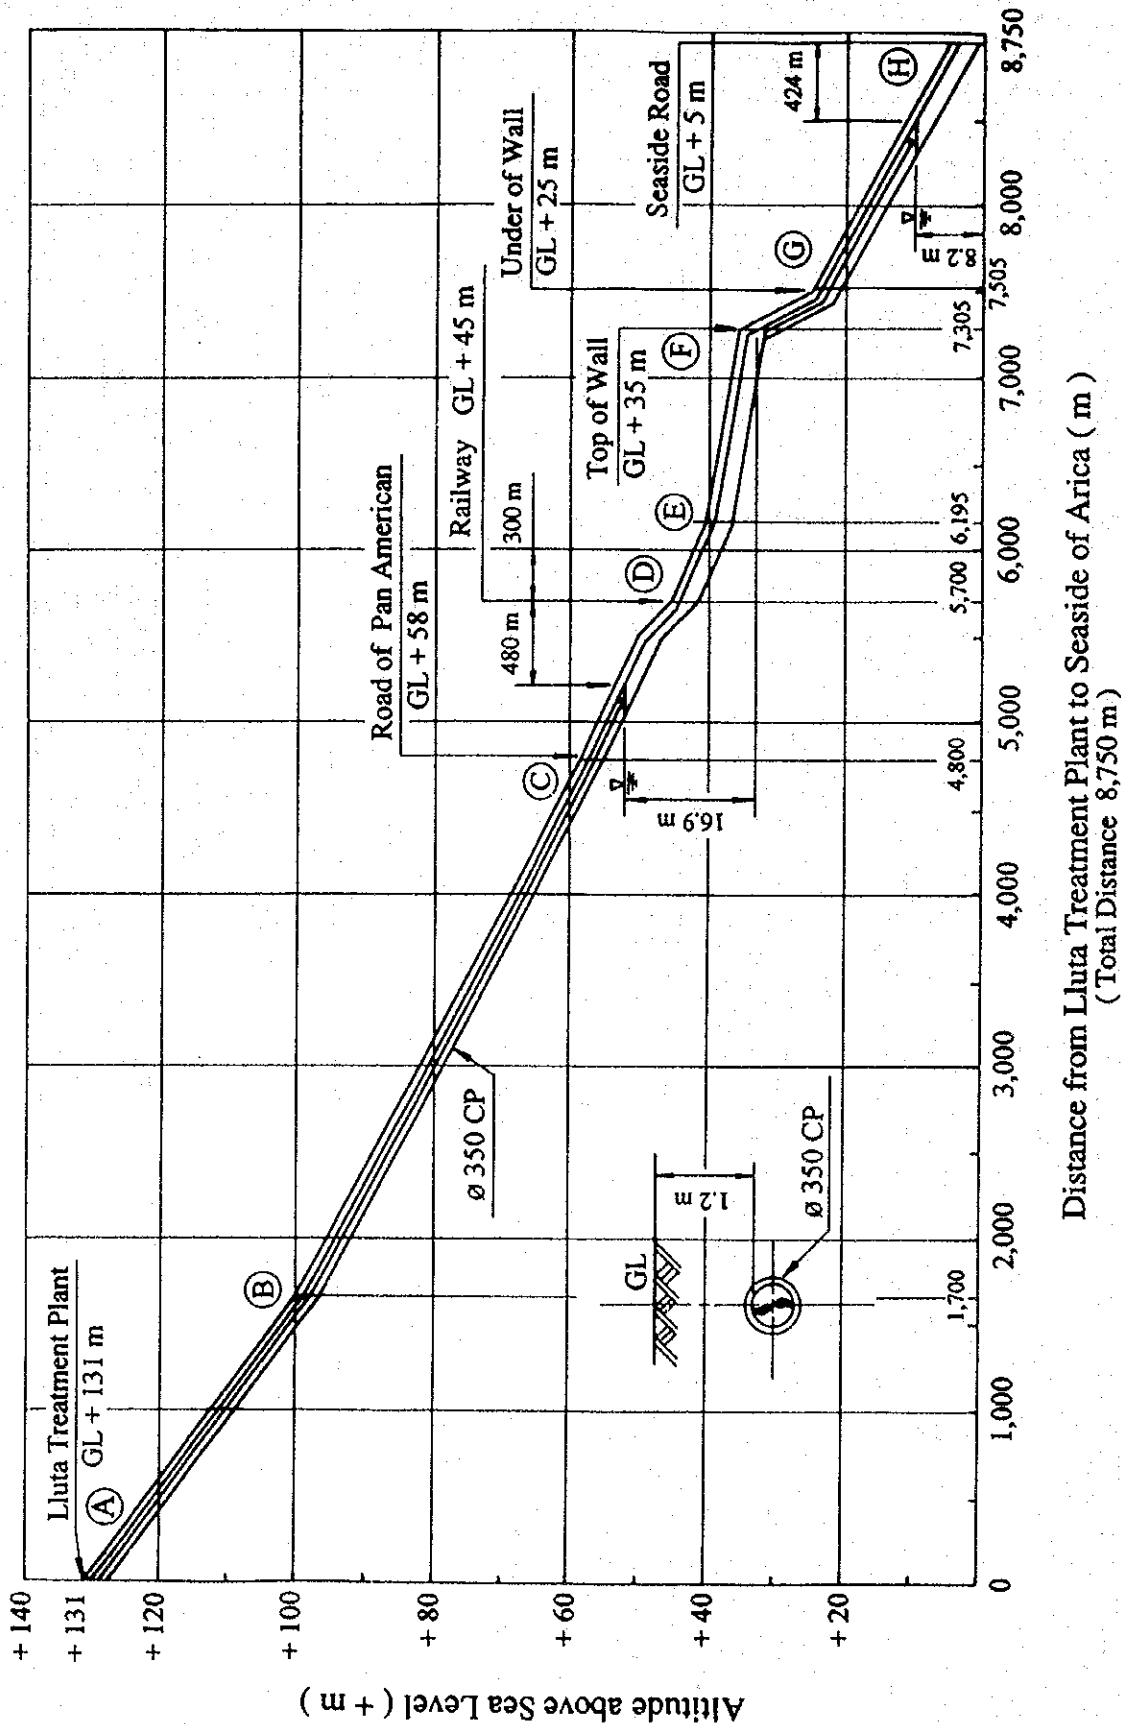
Detail Layout of Lluta Treatment Plant ( 2/2 )
